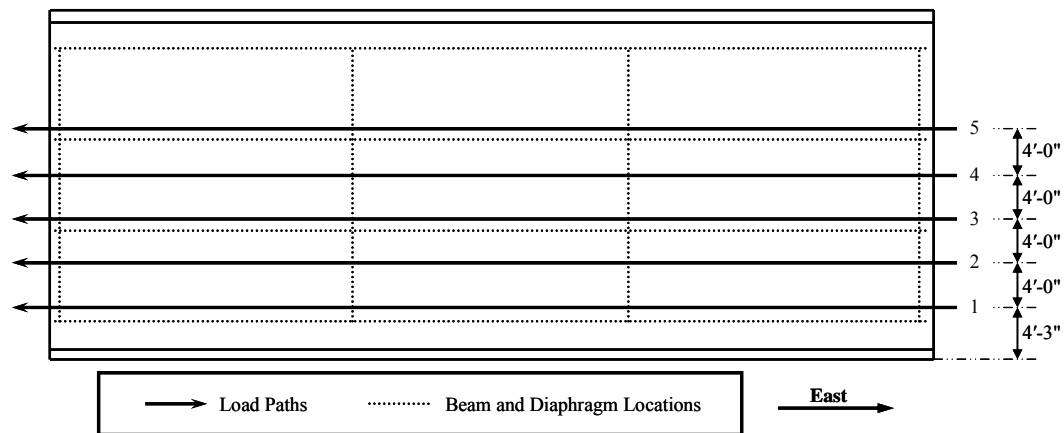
Plan of Loading Paths for Lake LBJ Load Tests
